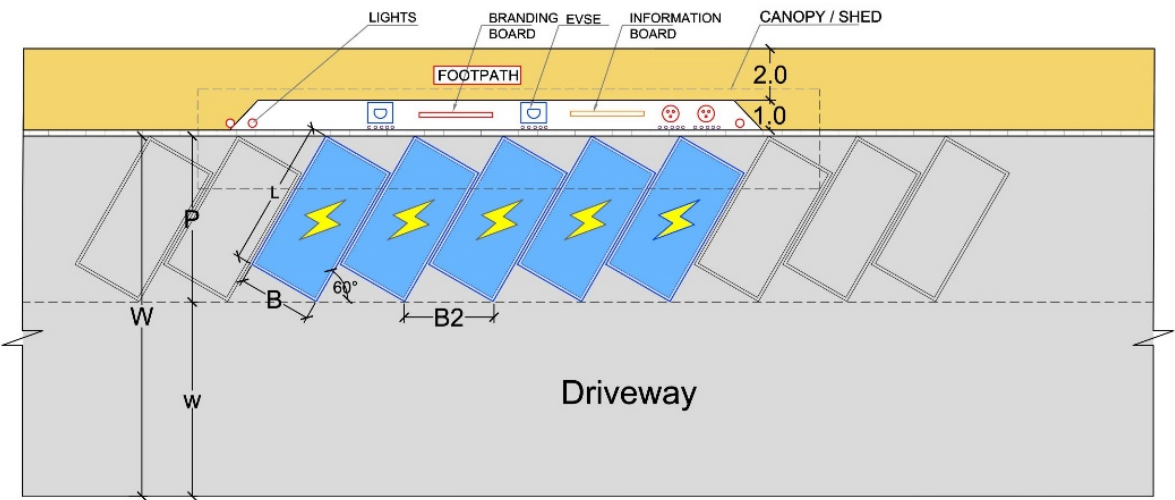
Diagonal On-Street Charging Layout (60-degree angle)
